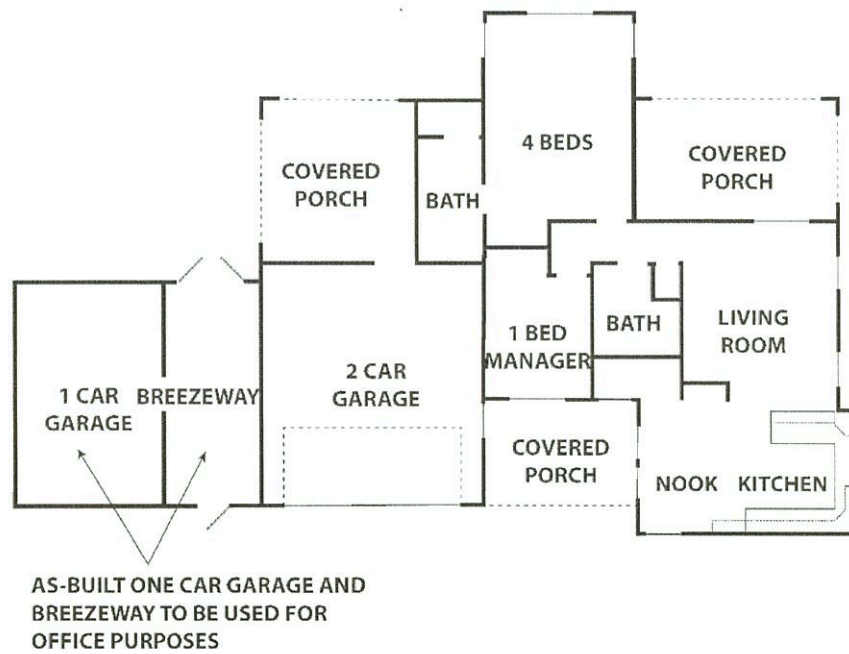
Floor Plan- Existing Accessory Dwelling Unit
